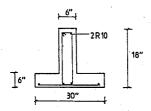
Cross section of Inverted T - foundation used for Housing scheme at Mattakkuliya
